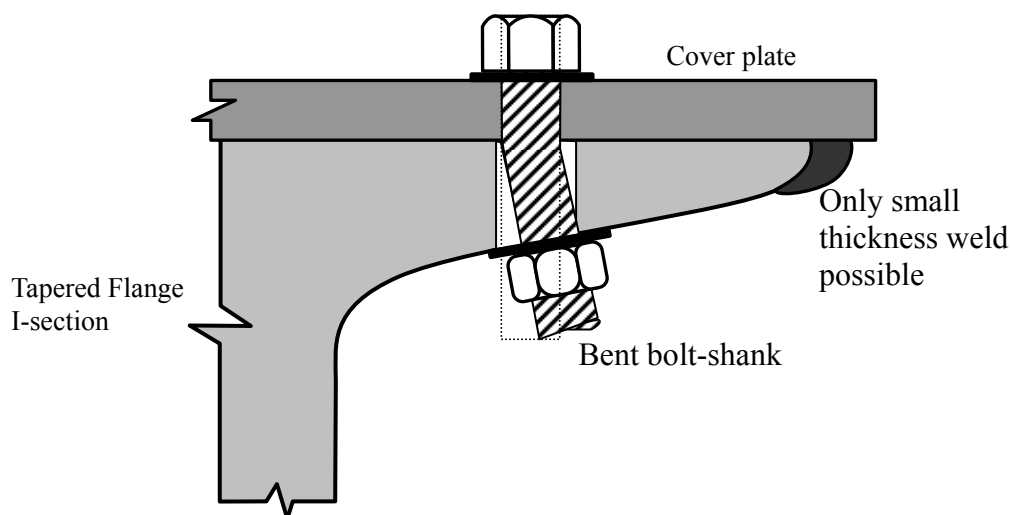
Effects of Tapered Flange: (i) Bolted Connection: Bolt Shank gets Bent on Tightening from the Original Straight Alignment and (ii) Welded Connection: Only Obtuse Angled Small Thickness Weld Possible at the Tapered Tip
